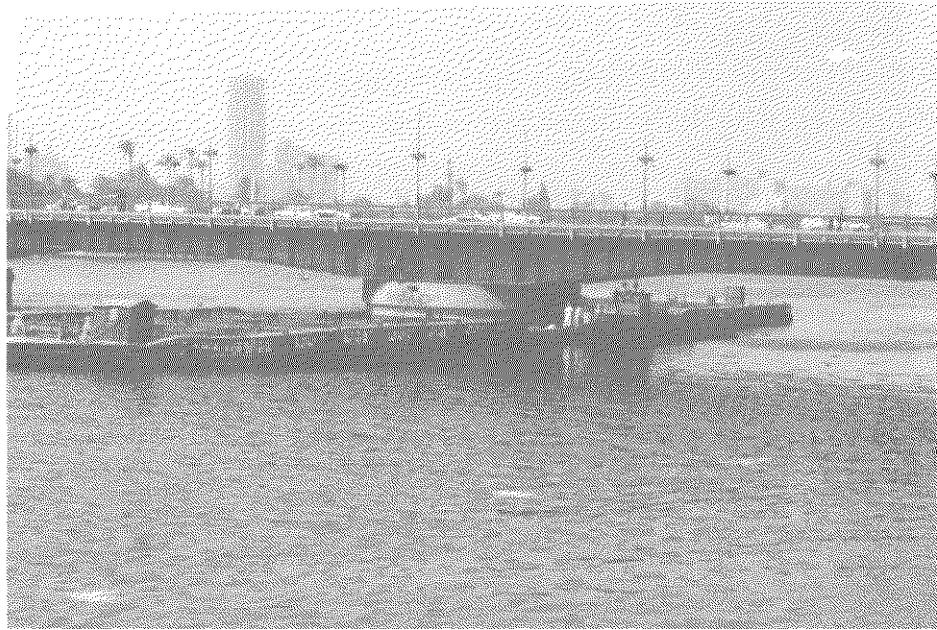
An old steel girder bridge with concrete deck lost part of the concrete deck.
